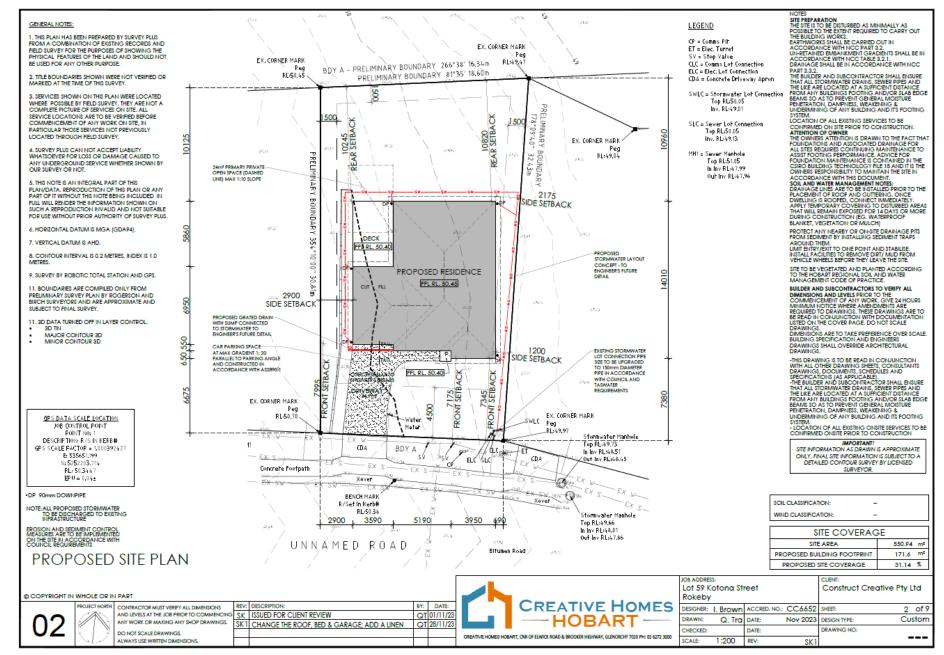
, Proposed development at 31 Kotona Street, Rokeby.
